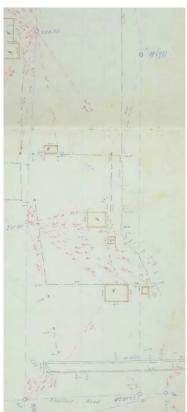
Detail from field books for the survey which informed Public Works Department Survey shown in Figure 55, November 1888. Showing the White Bay Hotel at bottom left (approximate location of additional construction footprint outlined in red), and outbuildings to the rear (east, on right). The pages do not match up exactly, and some structures were omitted. Source: Sydney Water Archives, PWDS 1544-S394, Balmain Sheet No. 51, Field Book No 1471.
